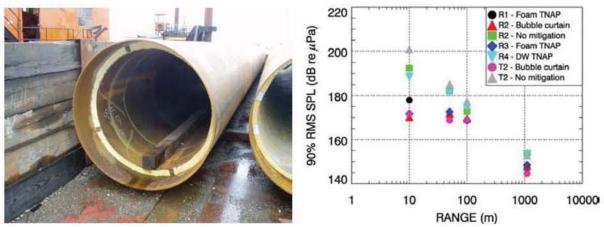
(Left) Sound attenuation methods. The pipe on the left in the picture is a double walled steel pipe with foam layer between walls. The pipe beside it on the right shows a single steel sleeve pipe with a foam layer. (Right) The diagram on the rights shows the effects of sound mitigation methods on the received 90% RMS SPL at four distances from the pile driver: 10 m, 50 m, 100 m, and 1100 m. All piles were 36-inch diameter steel pipes.
